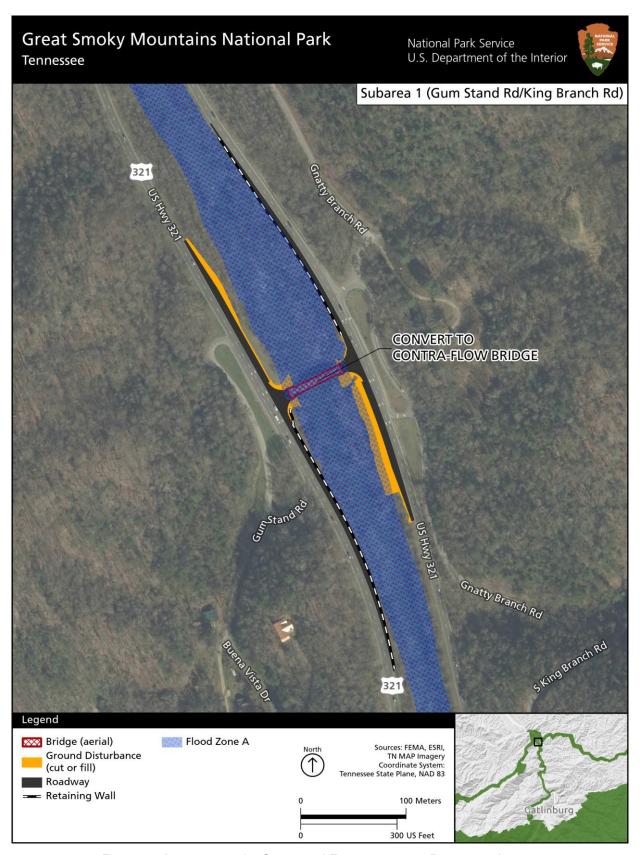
ALTERNATIVE 2—SUBAREA 1 FLOODPLAIN AND PROPOSED ACTION
